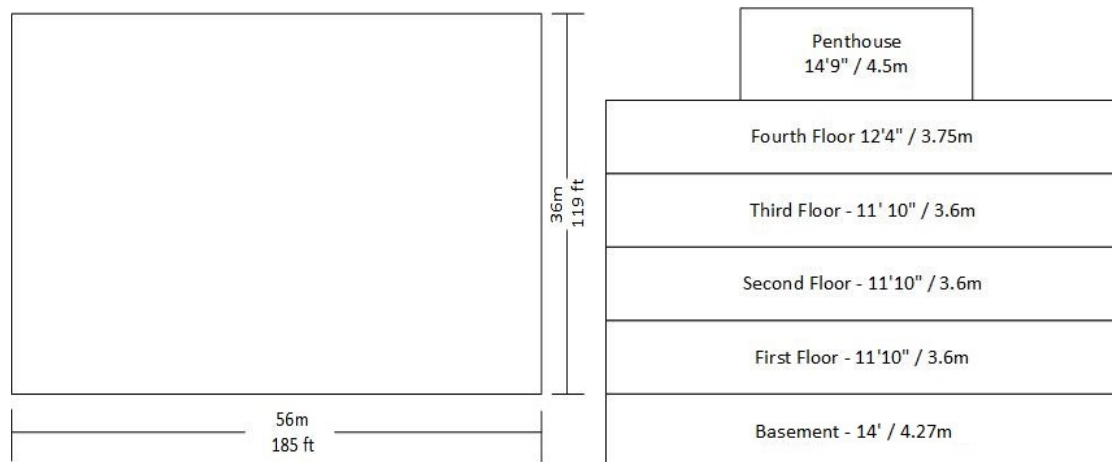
External building dimensions (left – footprint; right – floor levels)
